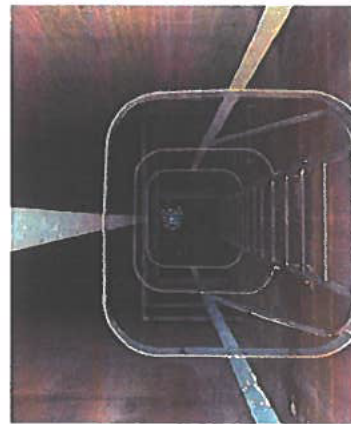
Pevensey Central Outfall - Inner chamber. South Sub-Chamber (Coast Road). Existing access arrangement.
